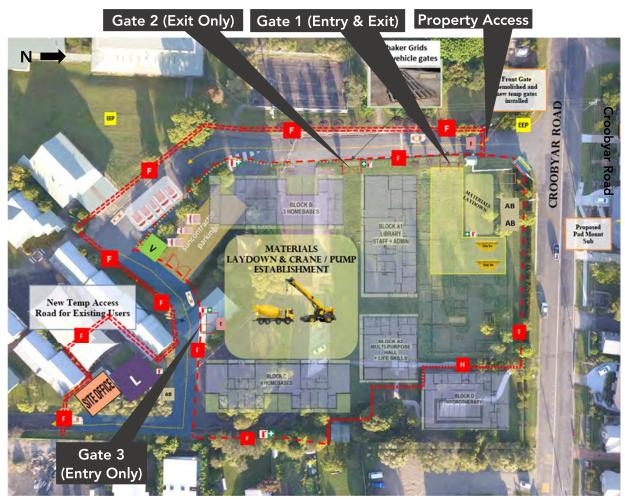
Stage 1 Site Establishment Plan (Source: Zauner Construction)
